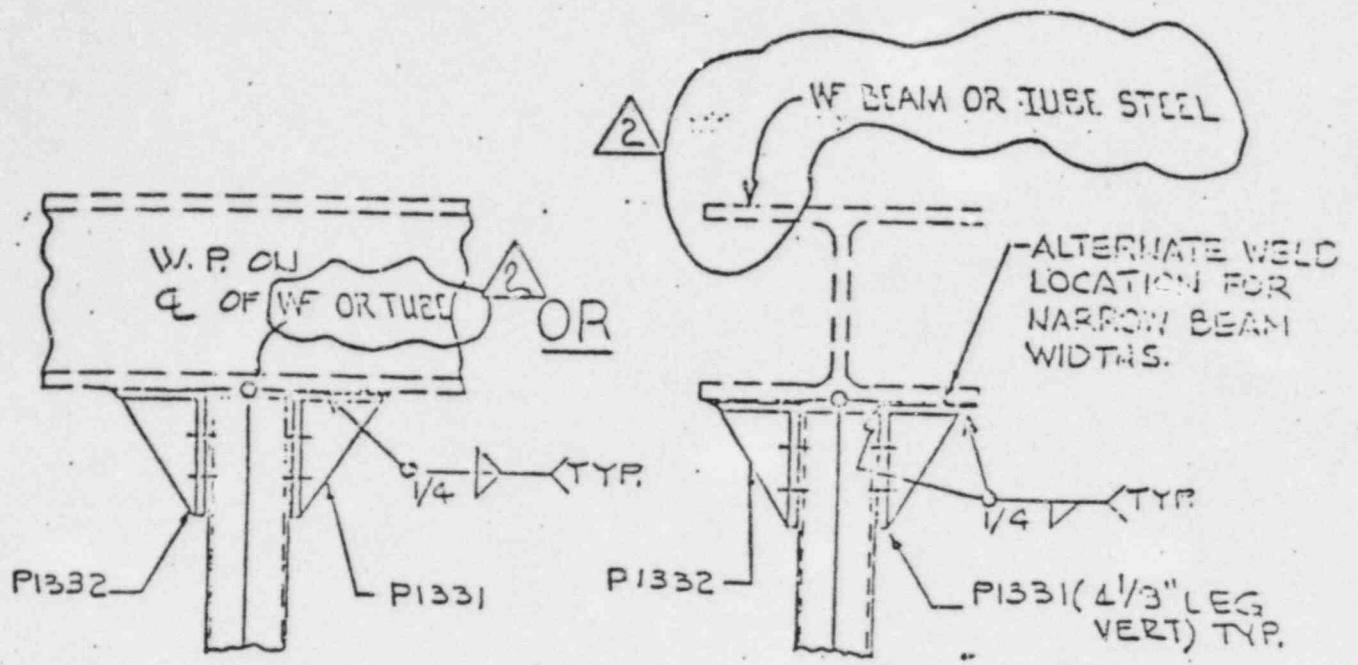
TYPICAL VERTICAL HANGER CONNECTION
